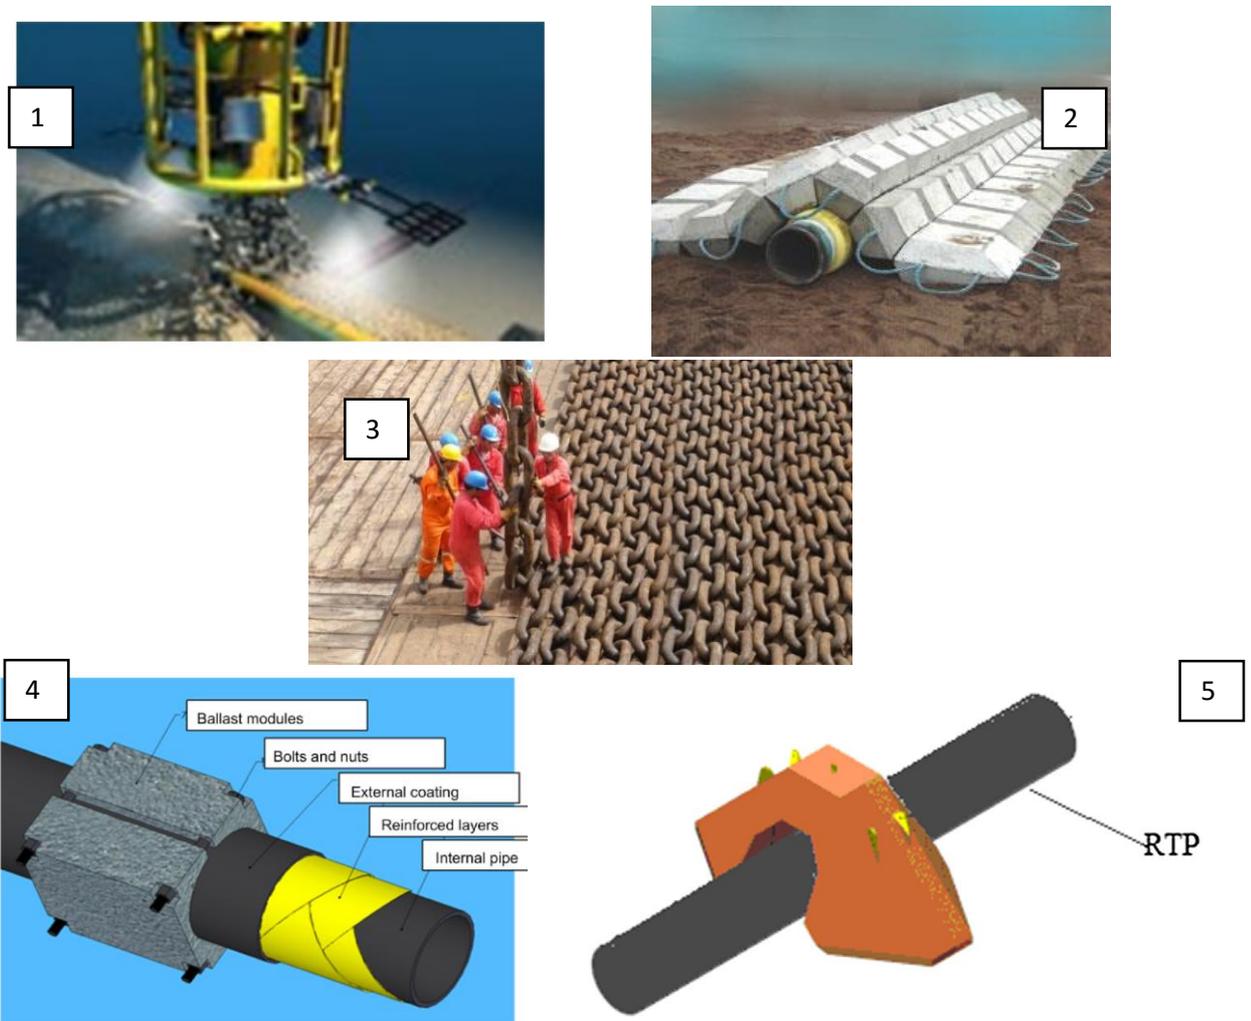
Offshore RTP anchoring methods (1-rock dumping, 2- concrete mattress, 3-chain, 4-rock bolts and 5-gravity anchor) [3]
